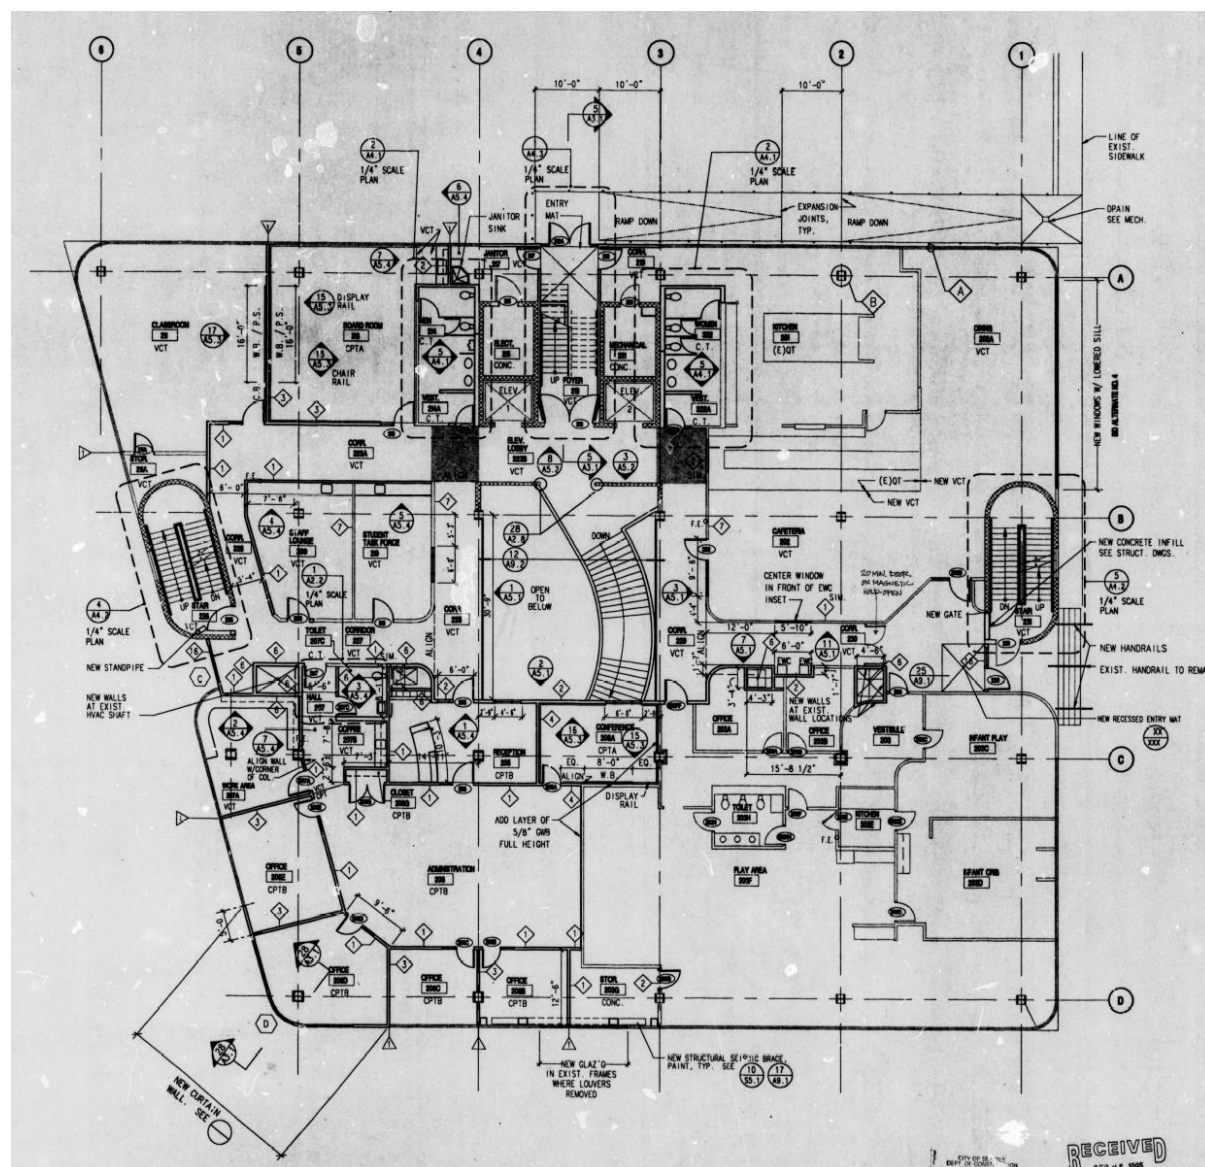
Second Floor Plan - 1996 Renovation, Johnson Architecture & Planning, 1995
